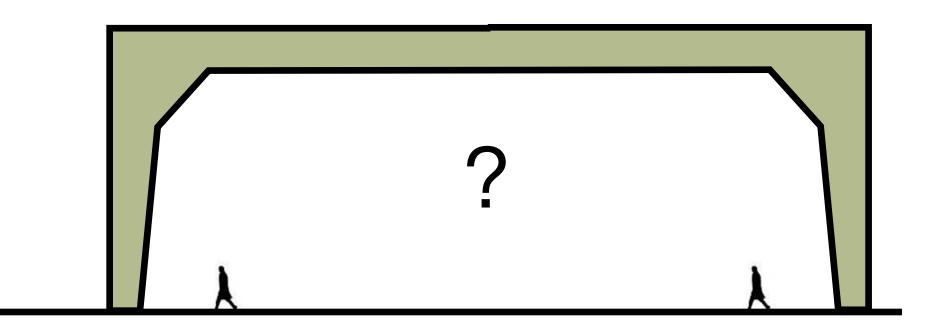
Large span structure to allow flexible operation of space 248
